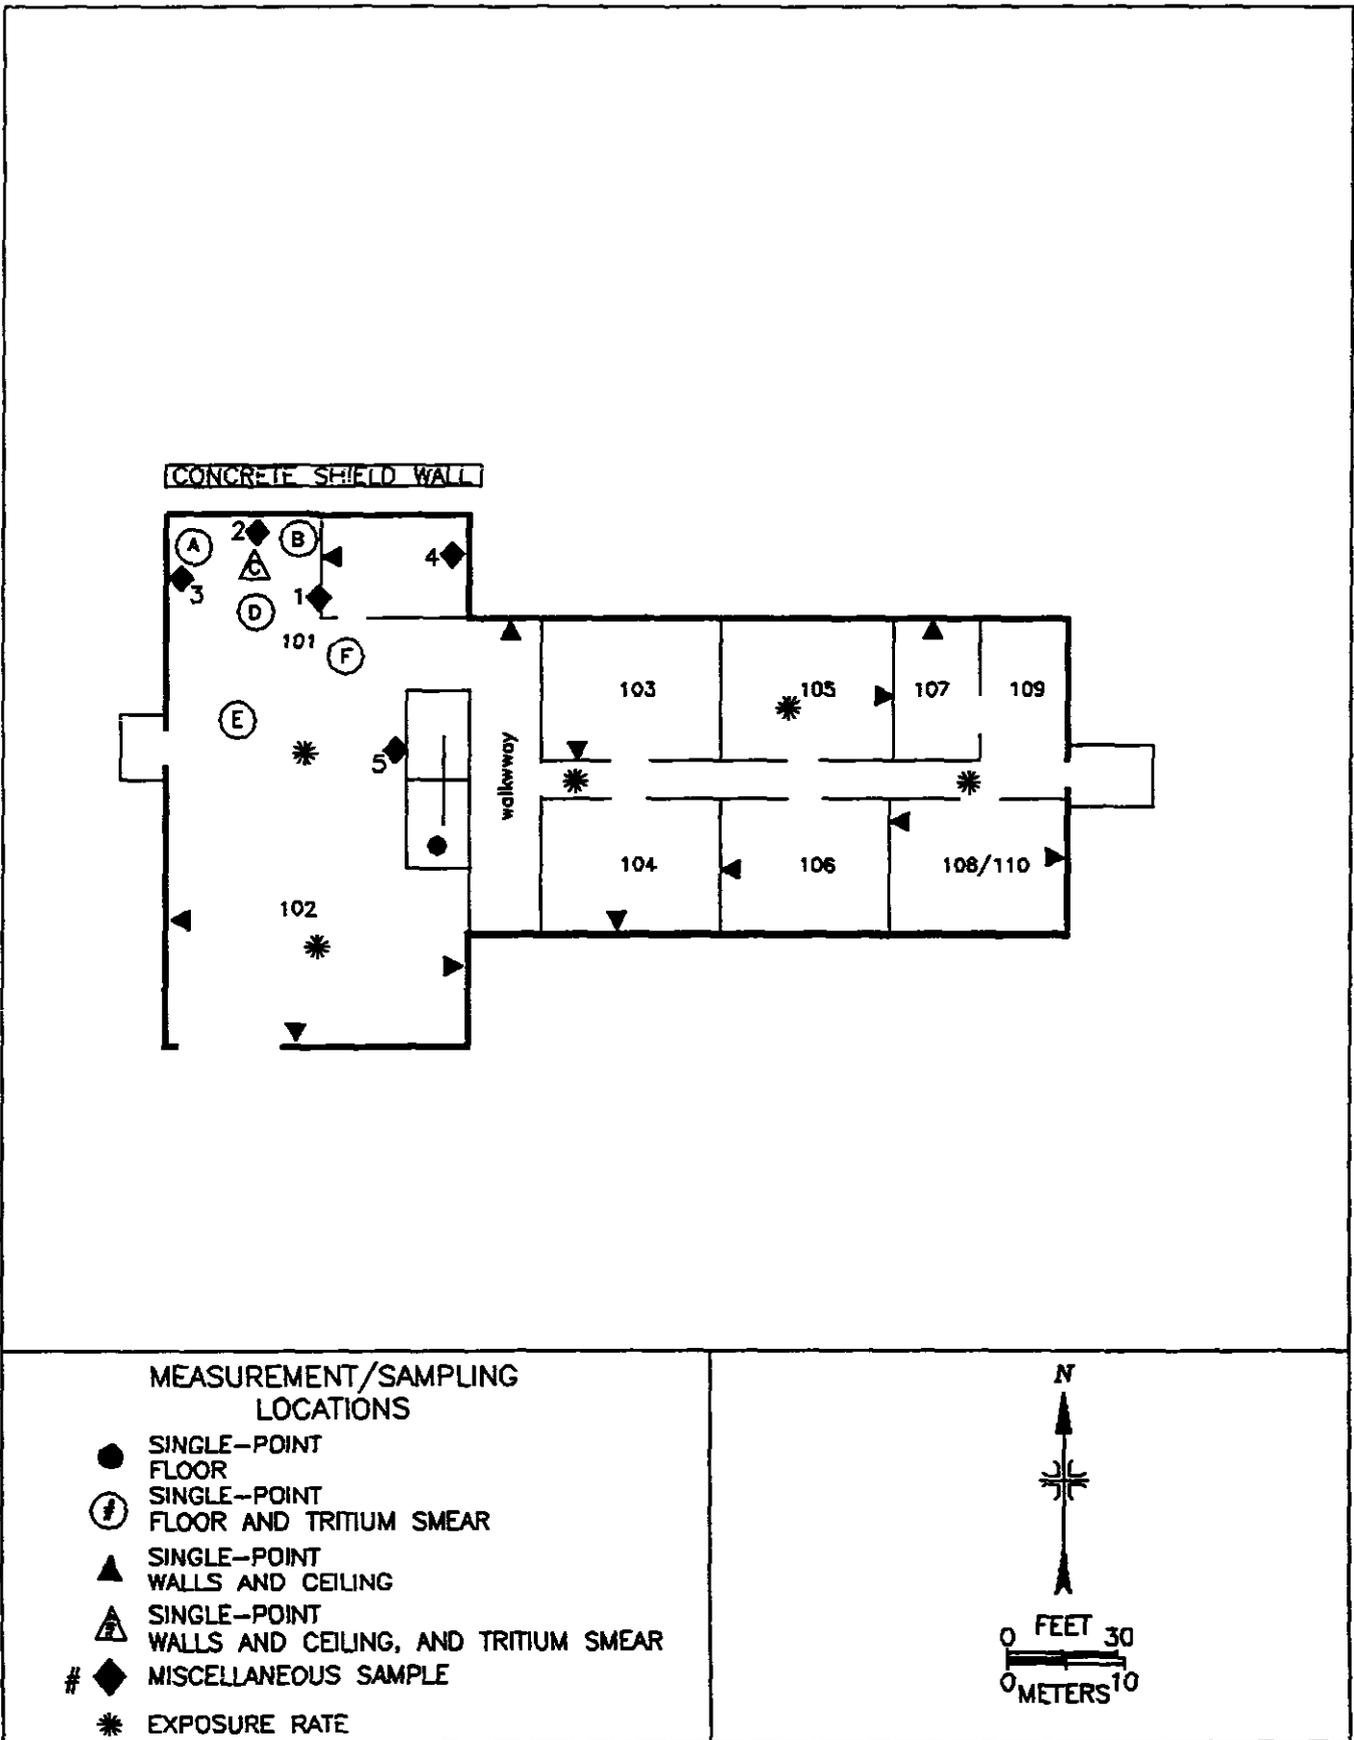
Building T030 – Floor Plan and Measurement and Sampling Locations
